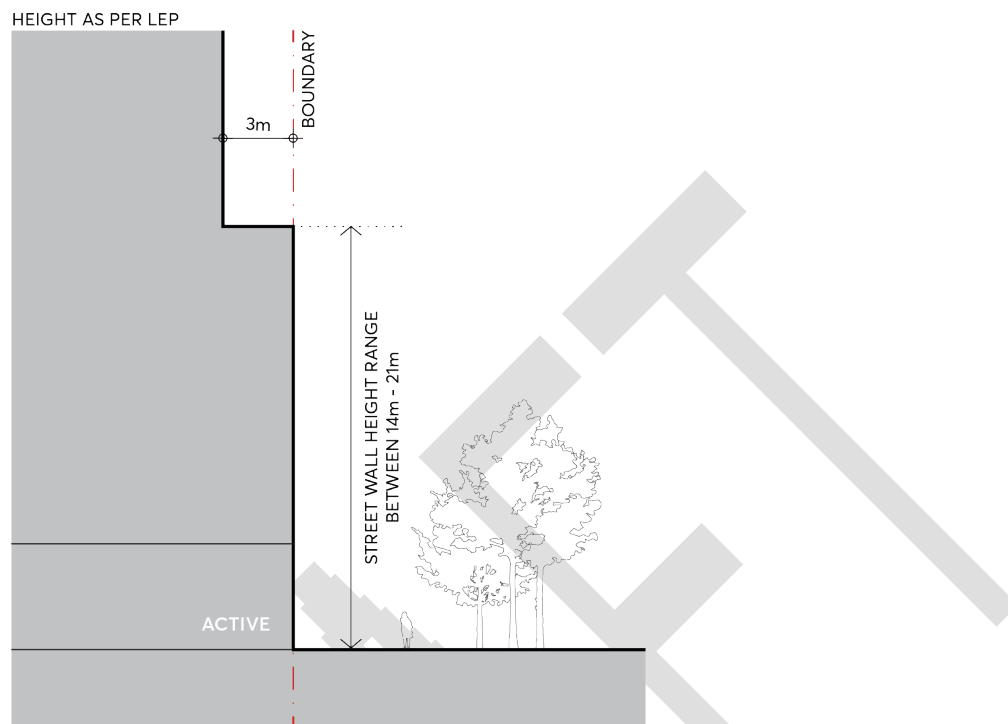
New Civic Space or Park Edge (Section G) Setbacks and Street Wall Height
